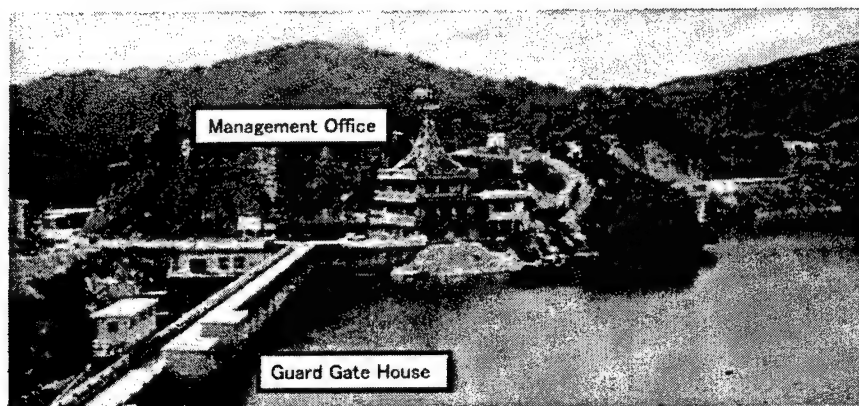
Elevator Tower and Guard Gate House of Kasho Dam
